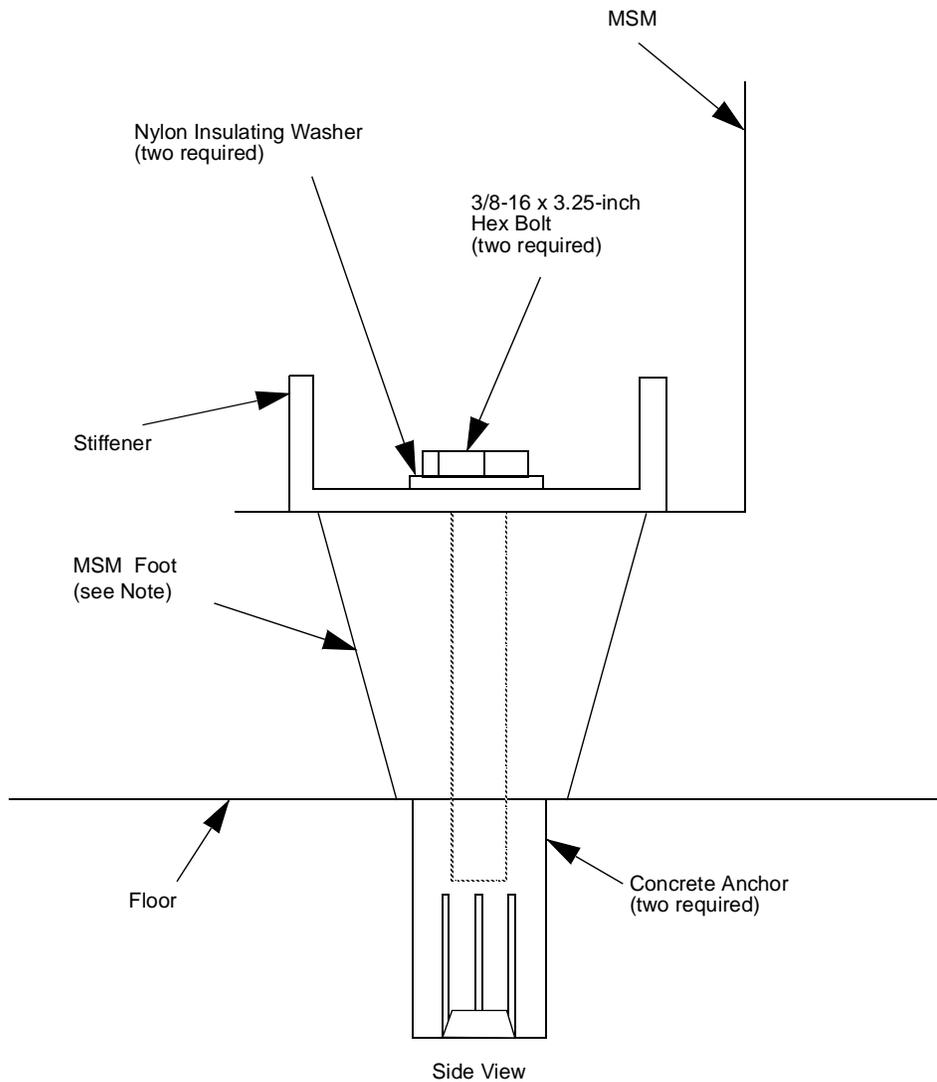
Front Mounting Angle-Concrete Floor
